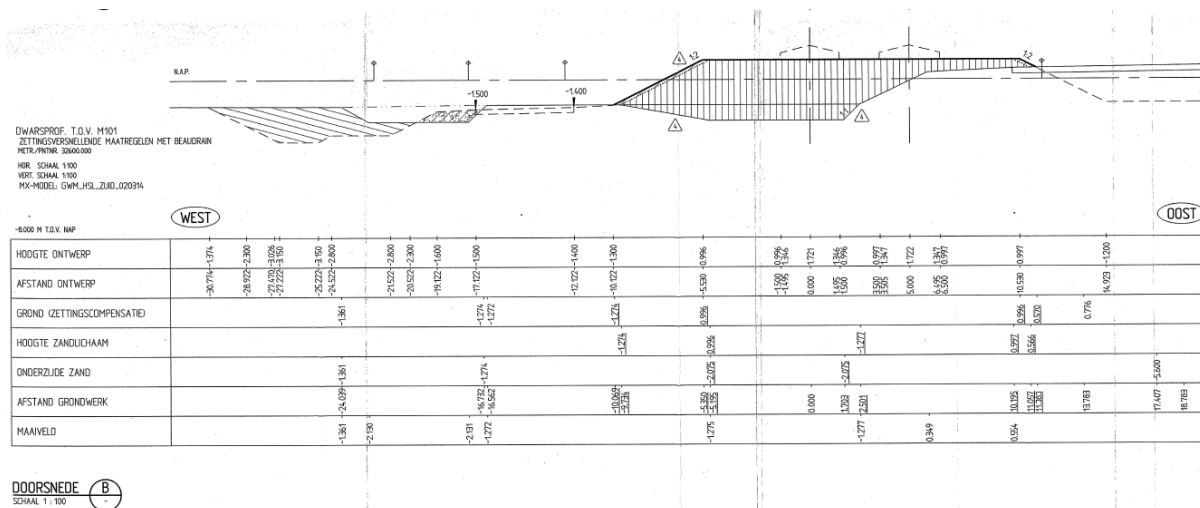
lateral cross section, Embankment constructed half on the highway cutnet (as built drawing HSL Grondwerk km 31.800-km 32.7)
